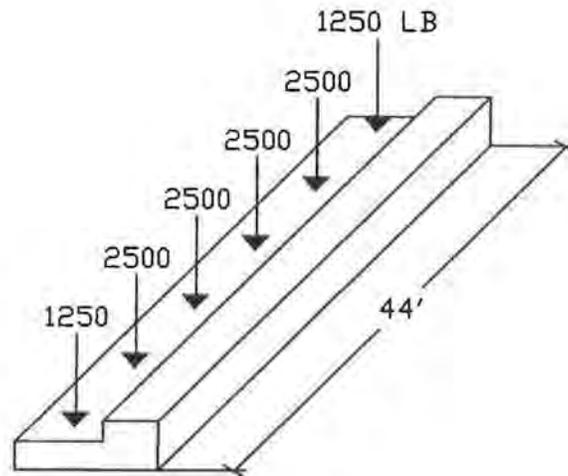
Abutment/Foundation Δ -Dead Load
